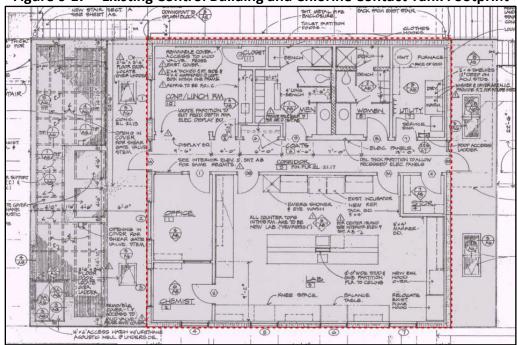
Existing Control Building and Chlorine Contact Tank Footprint
